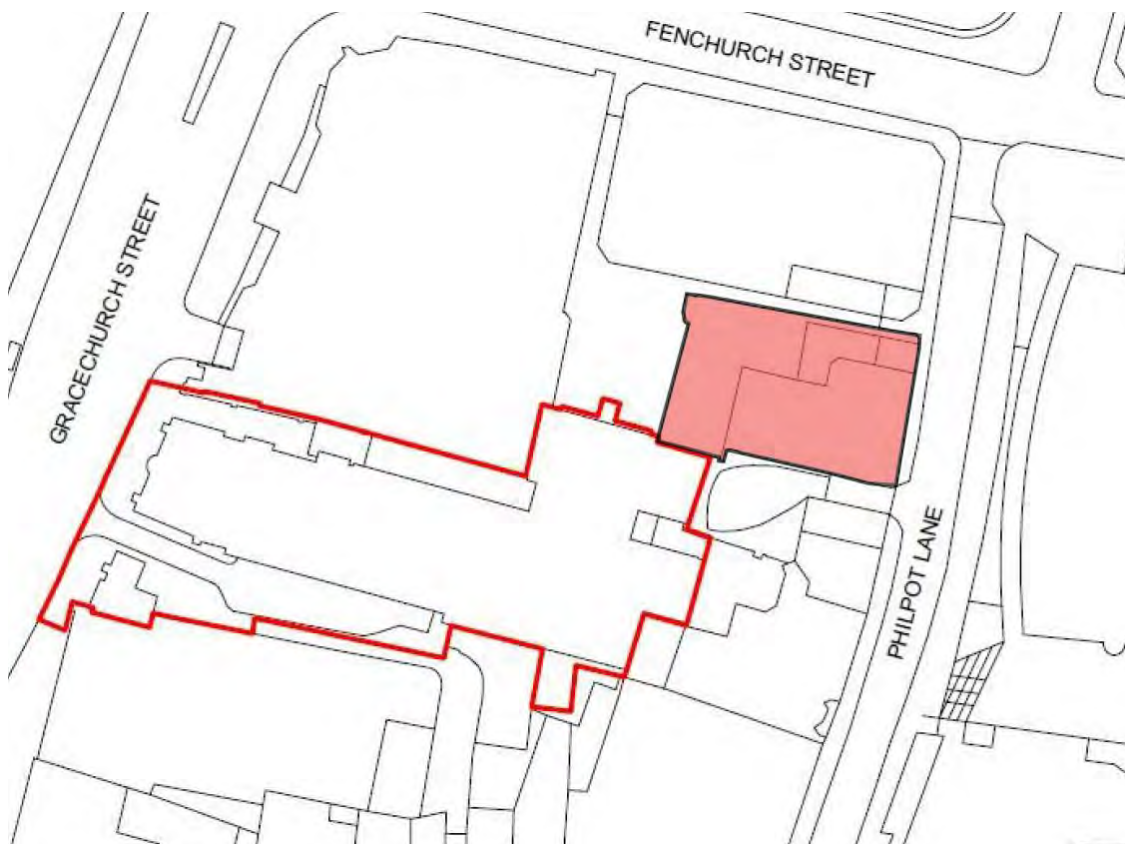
Location Plan of the application site (red outline) and clients site (red shade)
